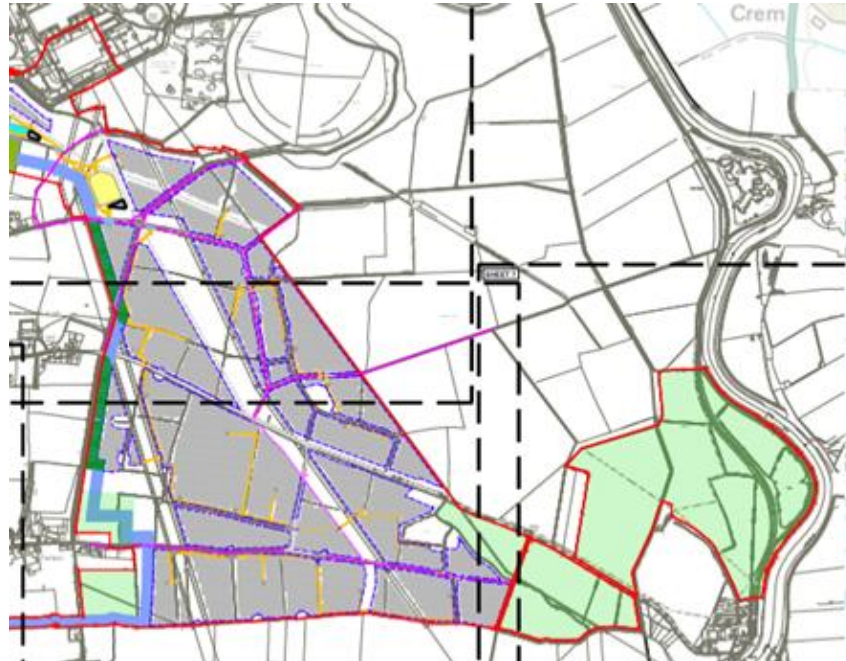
Extract of the Applicants Site Layout Plan [AS-009].
